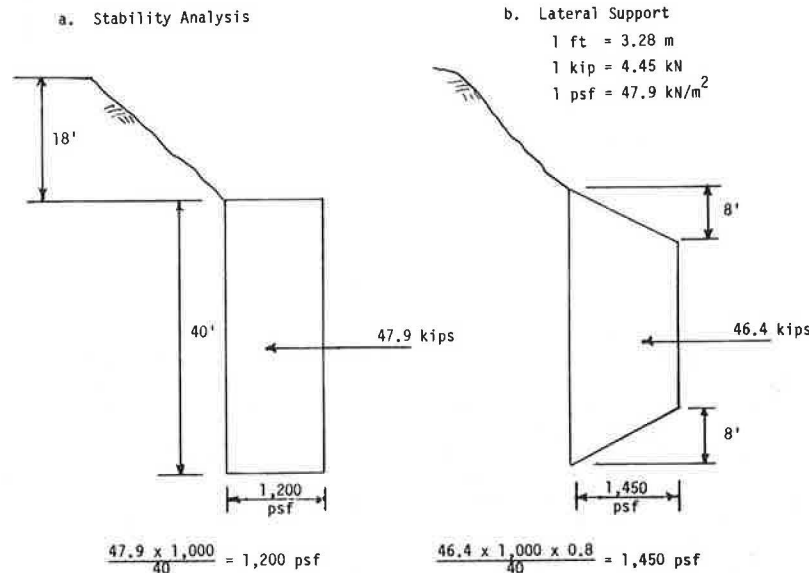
Design earth pressure envelopes for fourth rocky fill tieback slide control wall.
